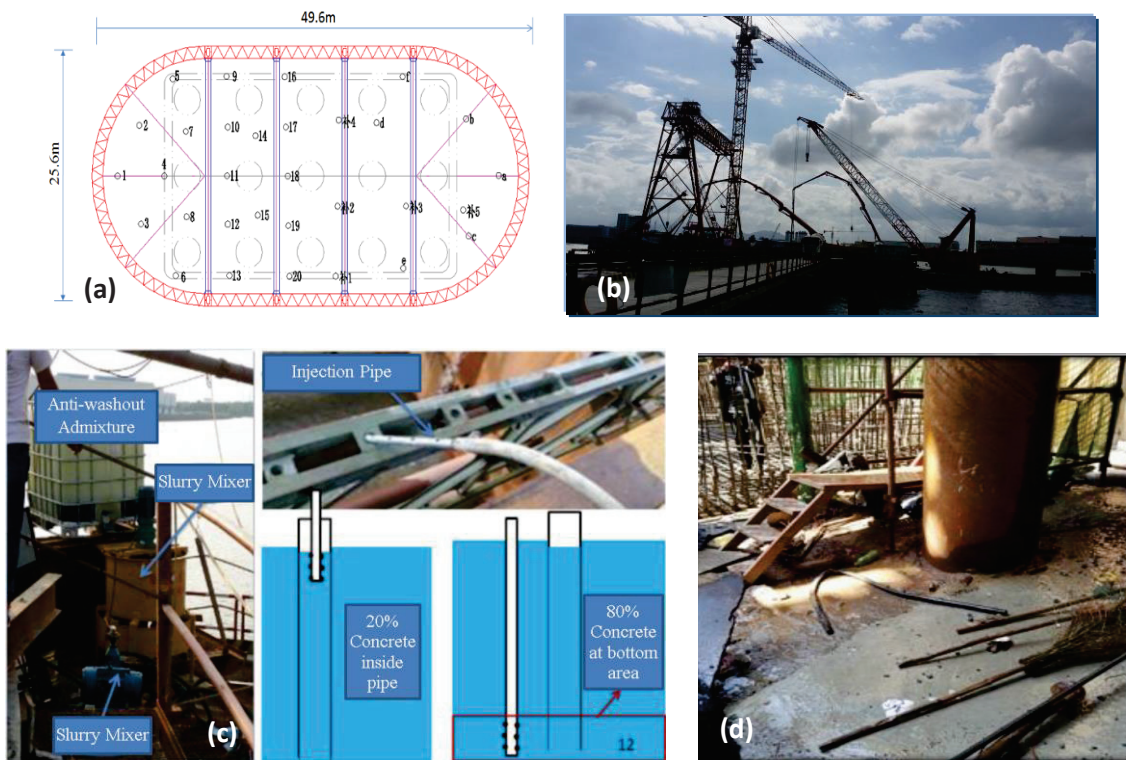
(a) Layout of SPUC construction, (b) construction of Tanjiang bridge, (c) dilution and casting of UPA, (d) piers bottom sealing after completed
